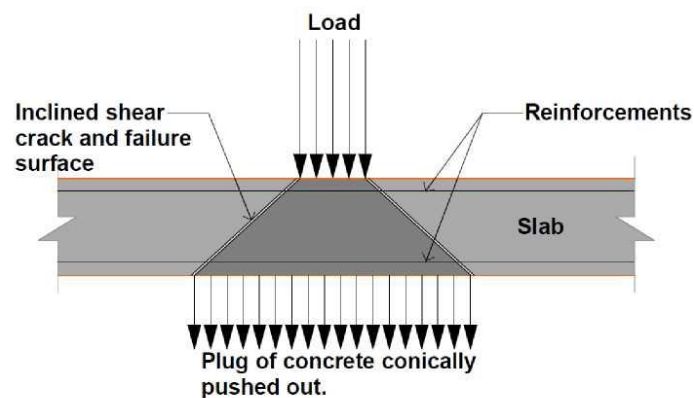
Punching shear failure section in concrete deck due to concentrated load
